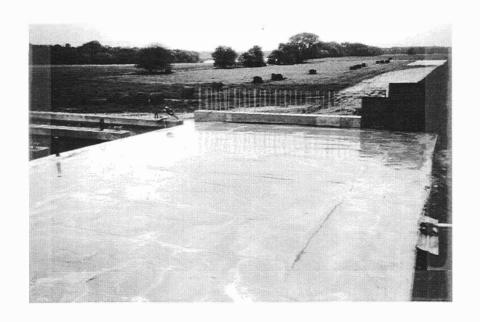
Completed CLSM Backfill, North Abutment, Bridge B
